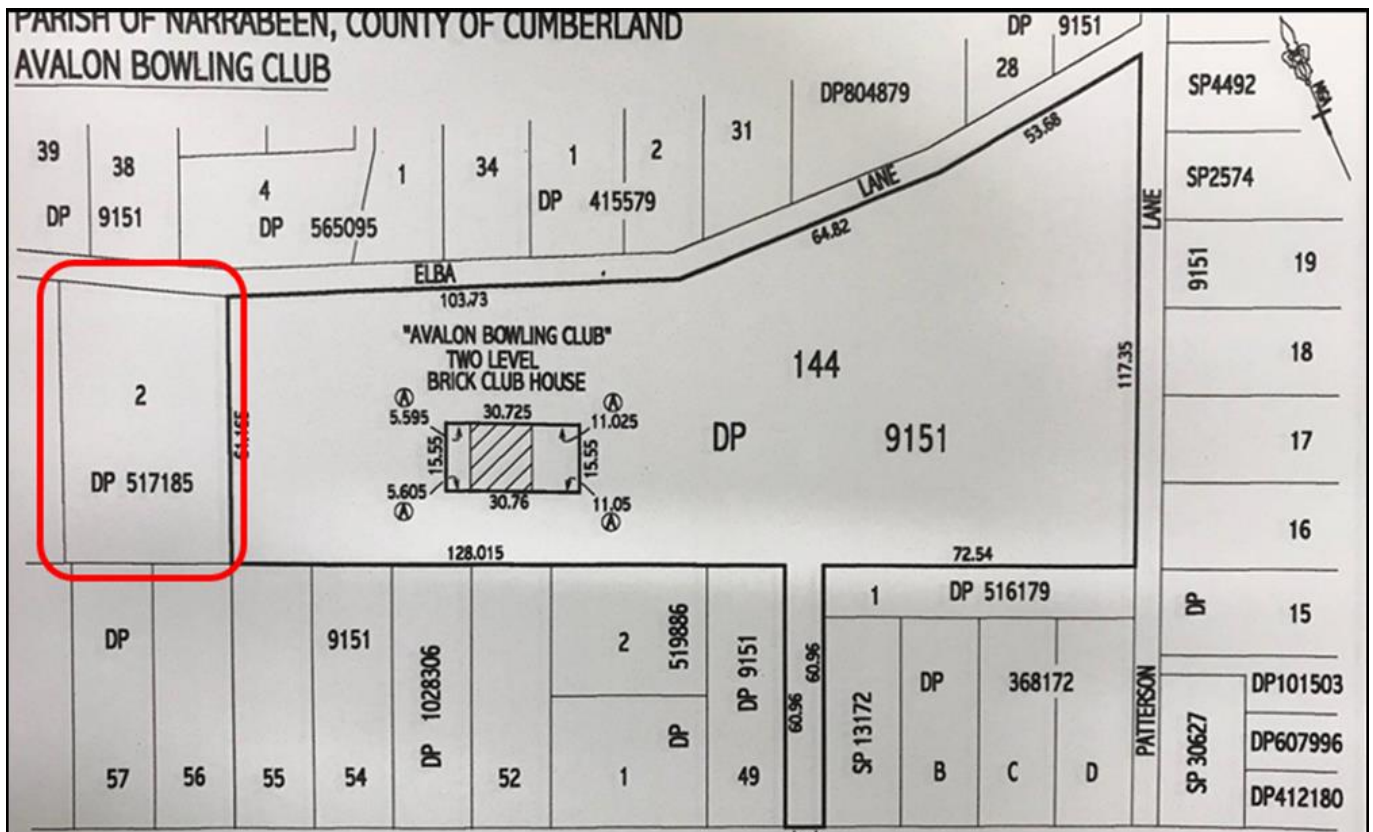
Plan of Subdivision Prior to Consolidation; Highlighted in Red, Lot 2 DP 517185 (Green 3).
